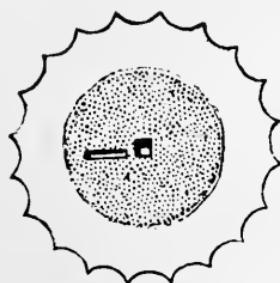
PLAN OF A GREEK DORIC COLUMN.
